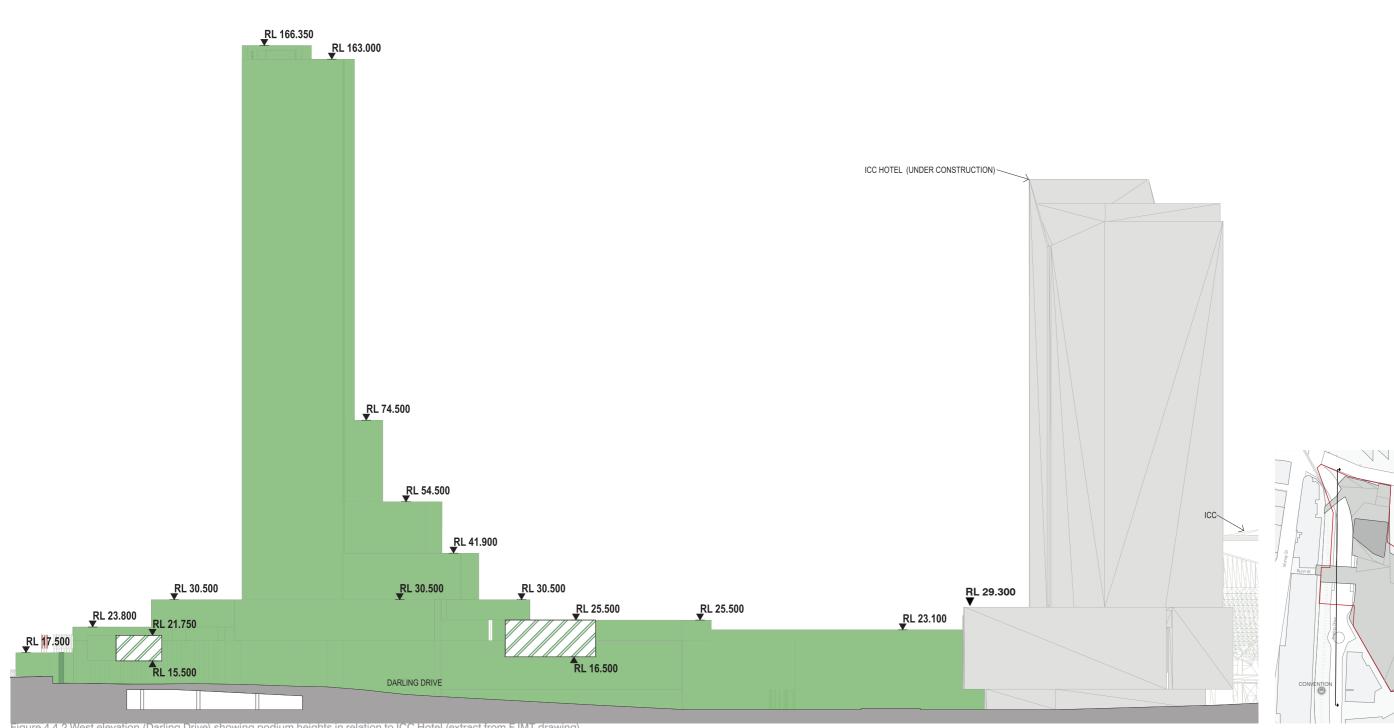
West elevation (Darling Drive) showing podium heights in relation to ICC Hotel (extract from FJMT drawing)
